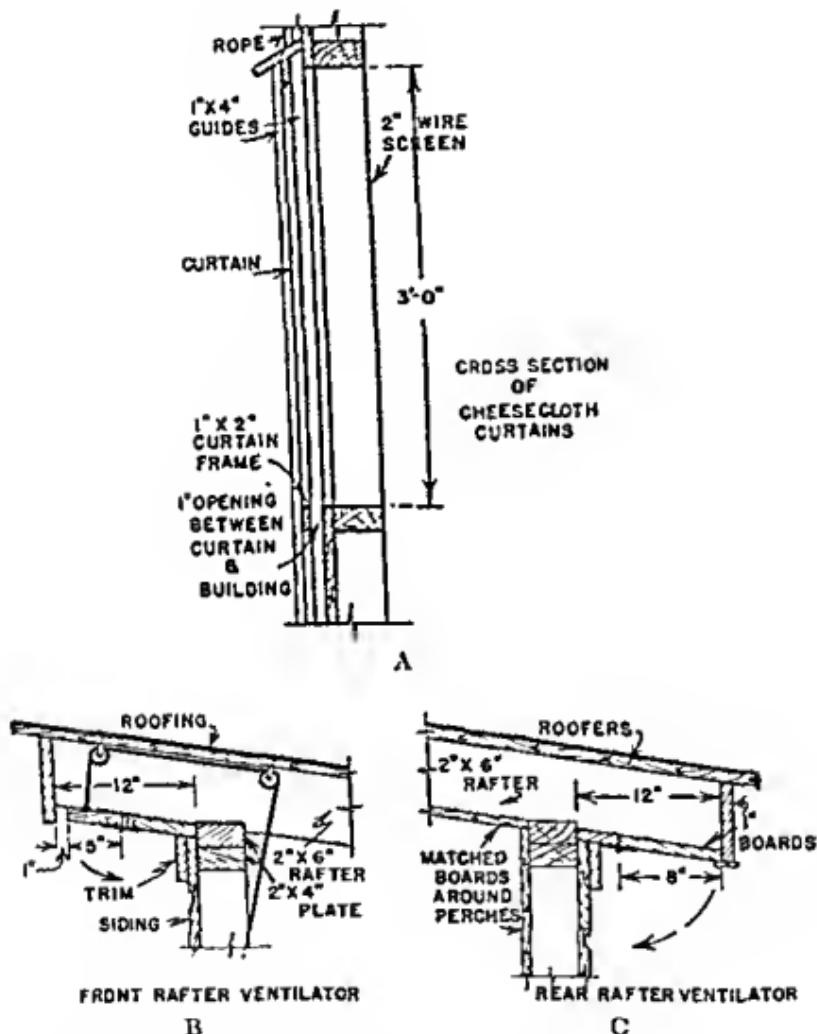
Rafter ventilation, construction of ventilator doors and curtains. A. The curtain is set away from the house 1", leaving a 1" opening at the bottom for an air intake in a tightly constructed house. B. The front ventilator door should be open in summer in a small house, but in winter it may be closed, as the 1" opening provides sufficient outtake. Houses larger than 20' \times 20' should have a 2" opening, which permits the ventilator to be constantly closed. C. The rear ventilator door should be closed in winter and opened in summer. Cornell University.
